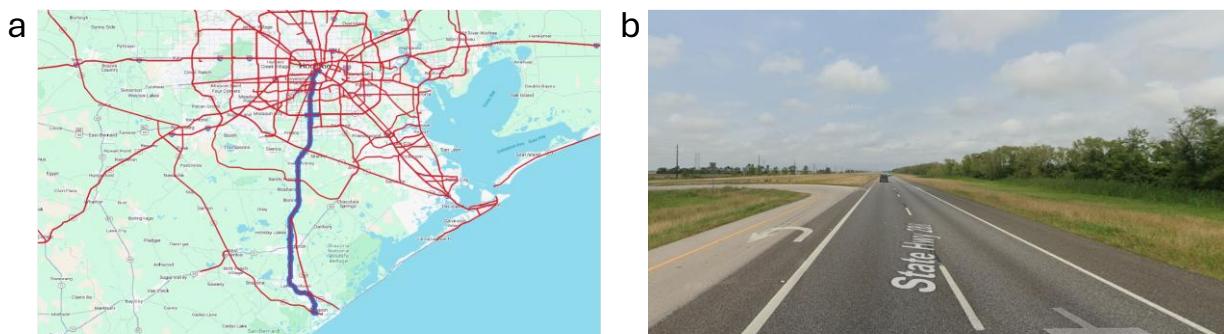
SH0288 Case Study: (a) Location and (b) Typical Pavement Surface View.
